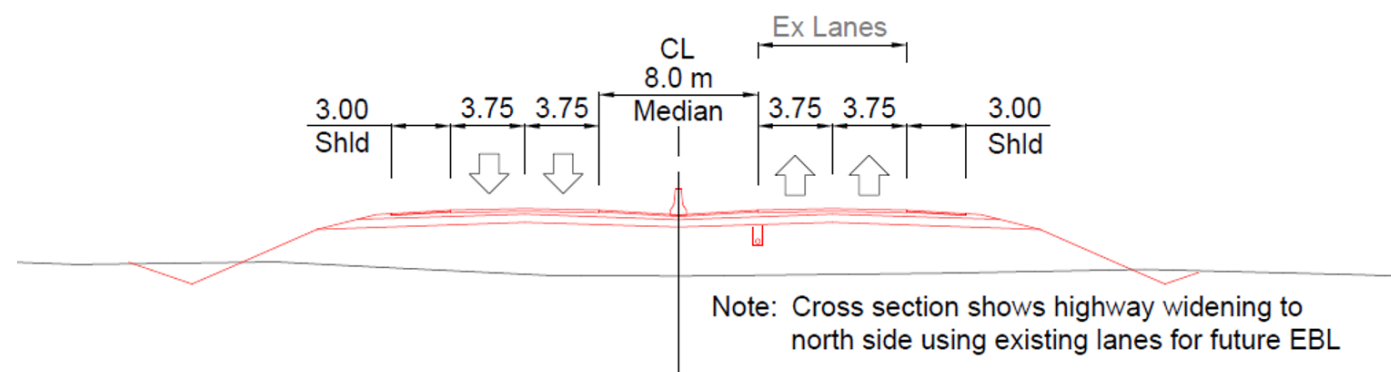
Highway 3 Cross Section Alternative 1: 8.0 m Median
